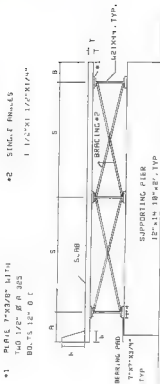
Cross Section of Specimen on Bulb-Tee Girders
